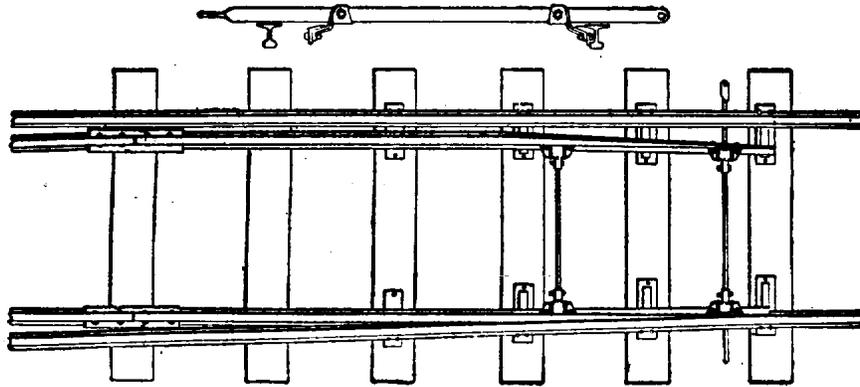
SPLIT SWITCH FOR LIGHT RAILS.
